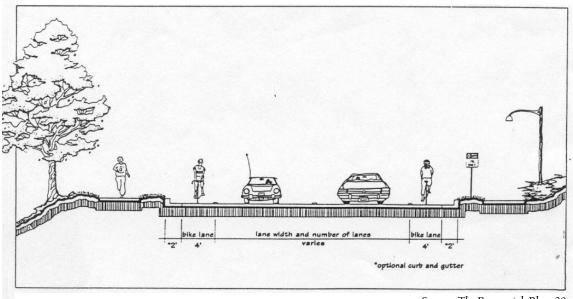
LOS 2-BIKE LANE, STANDARD SIDEWALK
